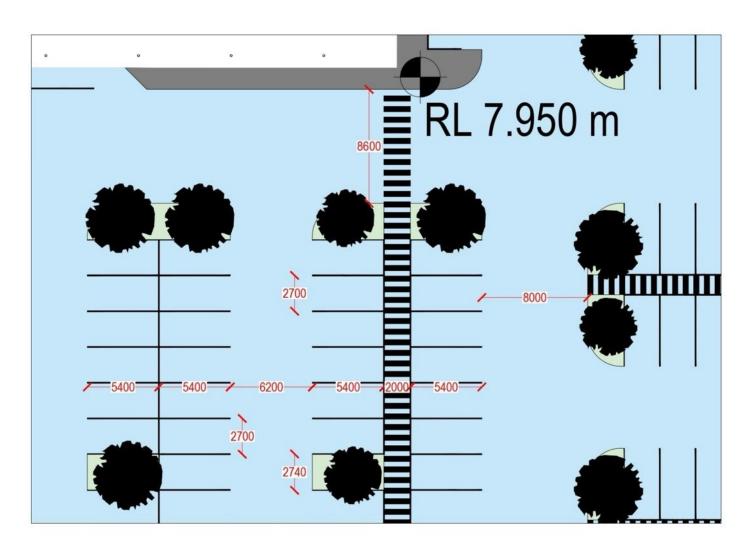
TYPICAL CAR PARKING DIMENSIONS
